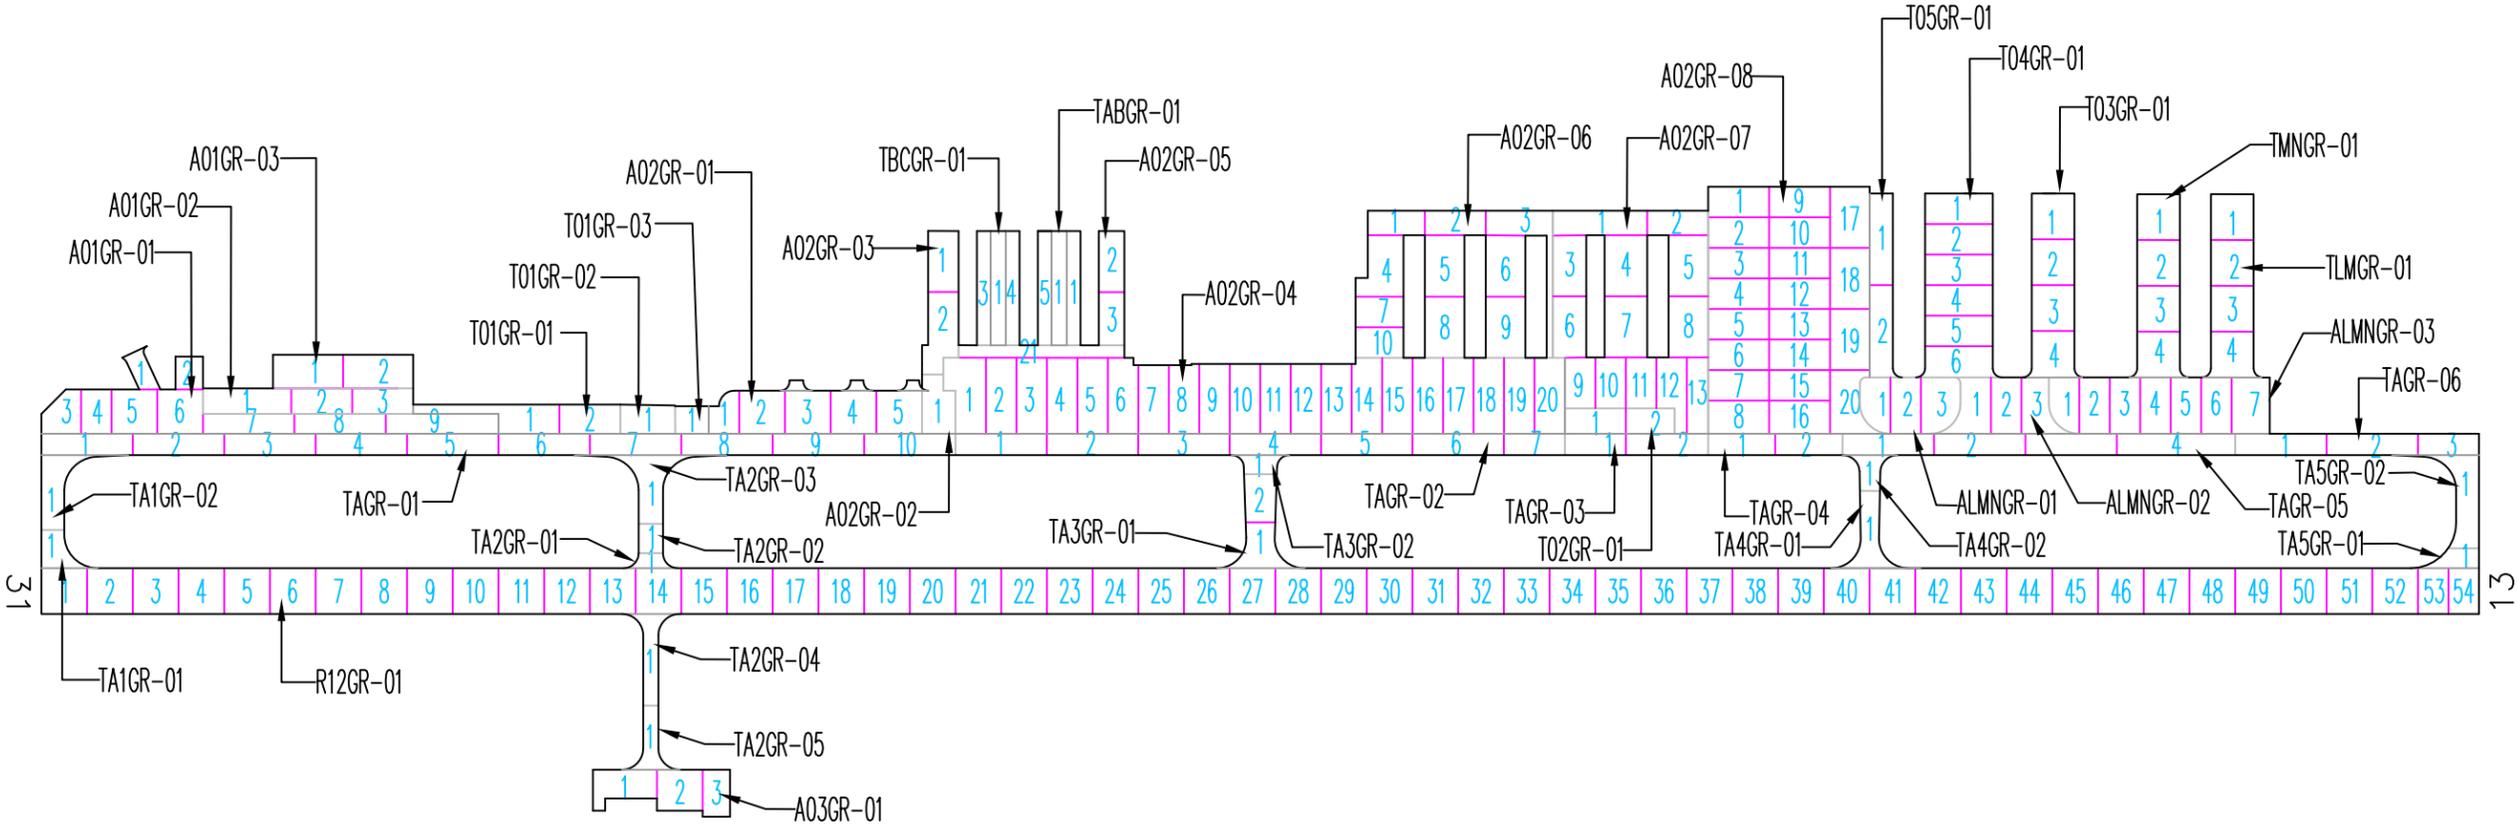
Pavement Branch, Section and Sample Unit Layout.
